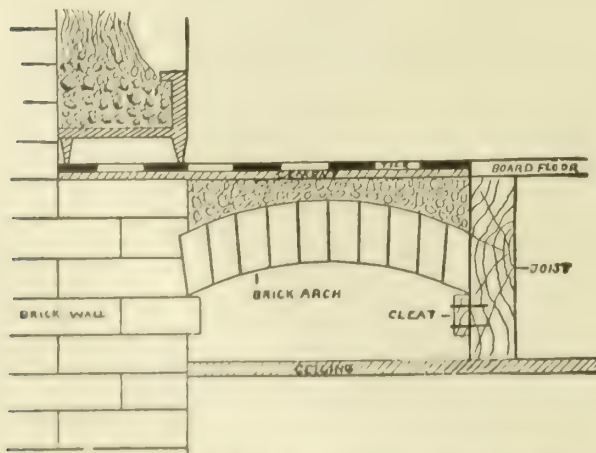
BRICK ARCH FOUNDATION FOR HEARTH
